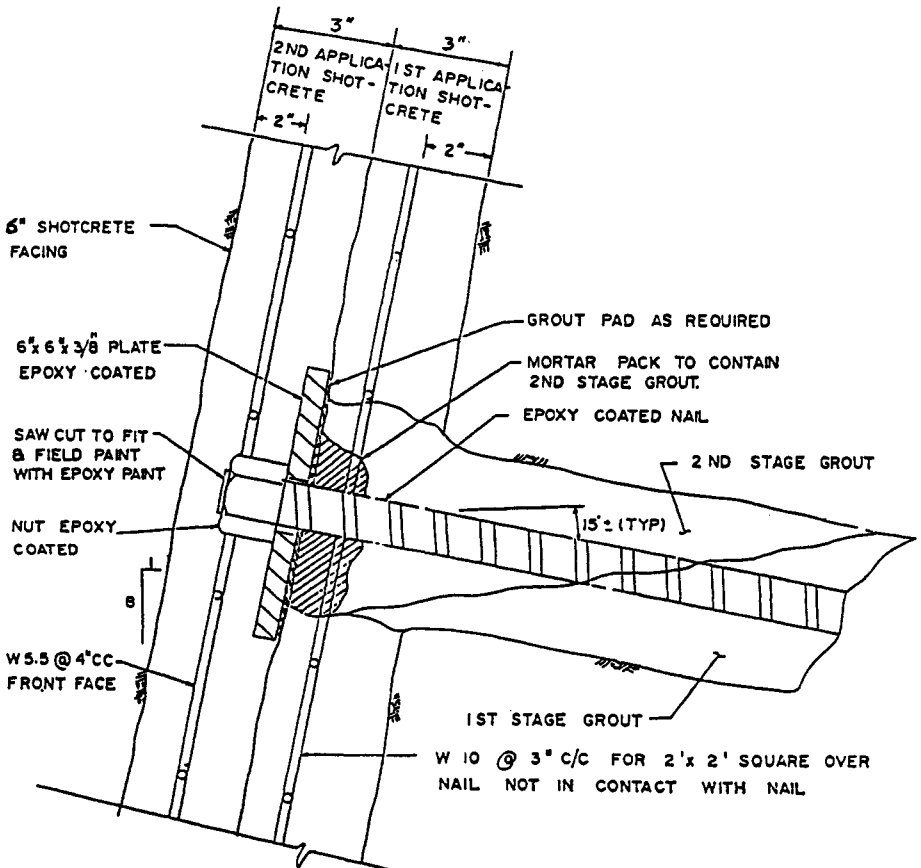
Typical soil nail wall details. (From Elias and Juran, 1990.)
